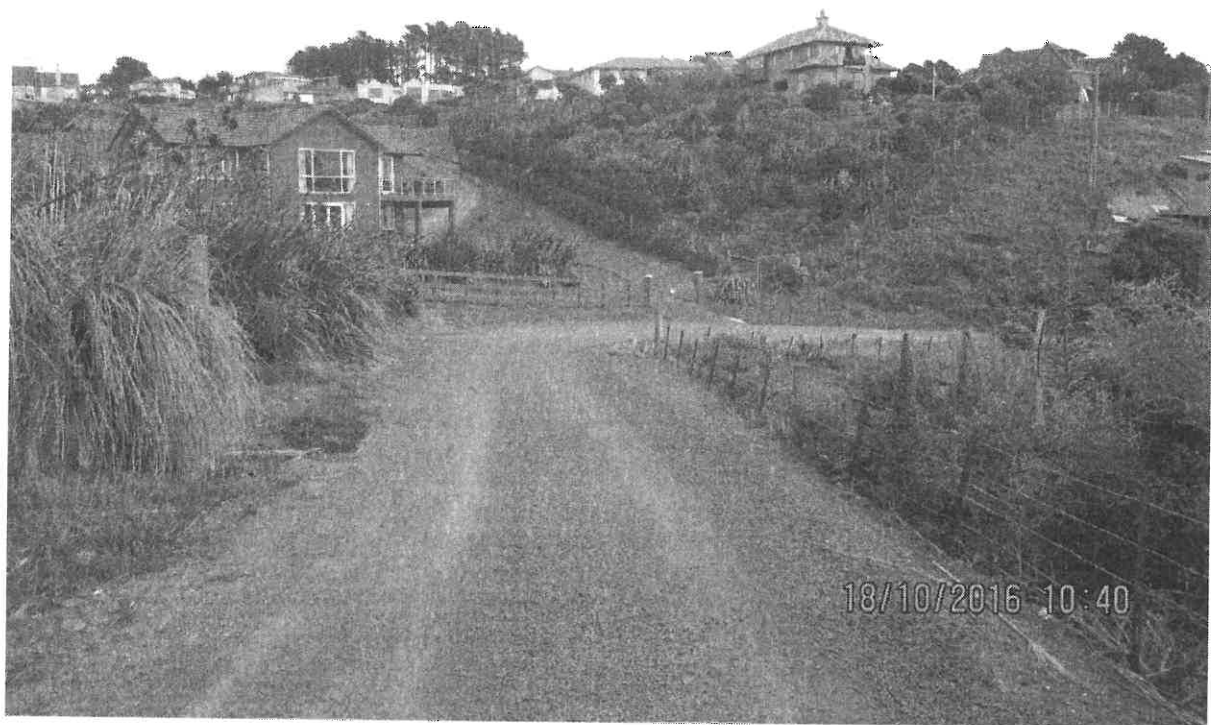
The Isadore Road section of the access, with 9 Highgrove on left.
